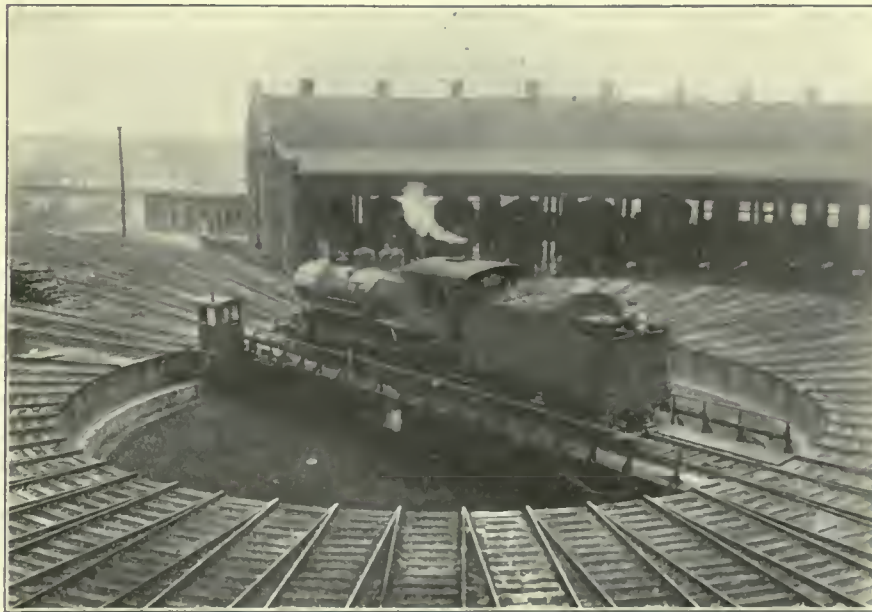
FACILITIES TO BE ABANDONED. Turn-table and pit of the Lake Shore & Michigan Southern Railway, near 63d Street and Indiana Avenue. This is a 90-foot deck plate-girder turn-table with electric tractor and is typical of many such structures in Chicago. The pit has a concrete back wall and is exceptionally deep. In the event of electrification, this table would be of no further use to the railroad in its present location.
